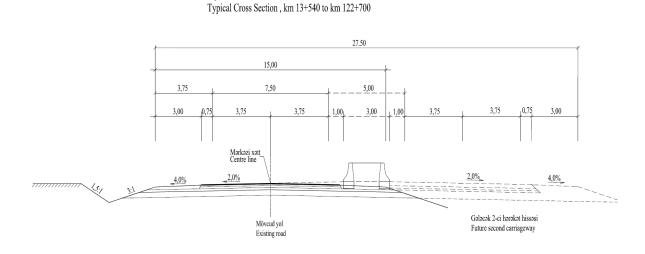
Option (i) Typical Cross Section for Widening to One Side
